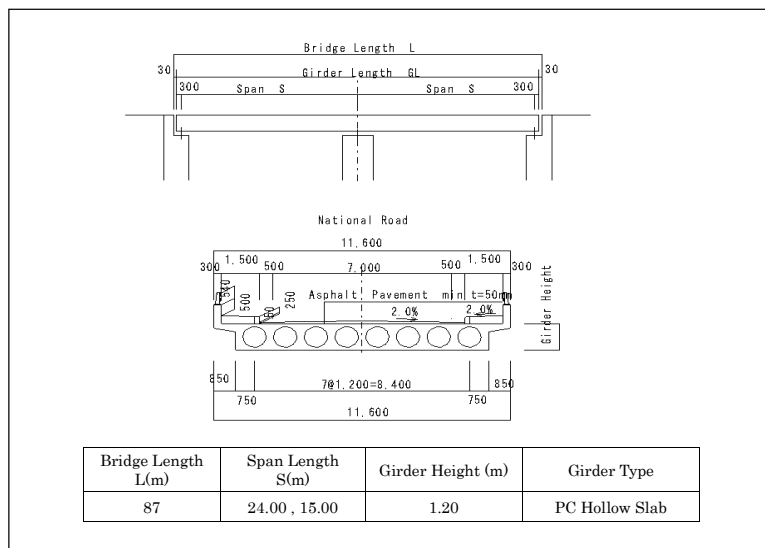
General Drawing of PC Hollow Slab Bridge for Bridge Construction Type
